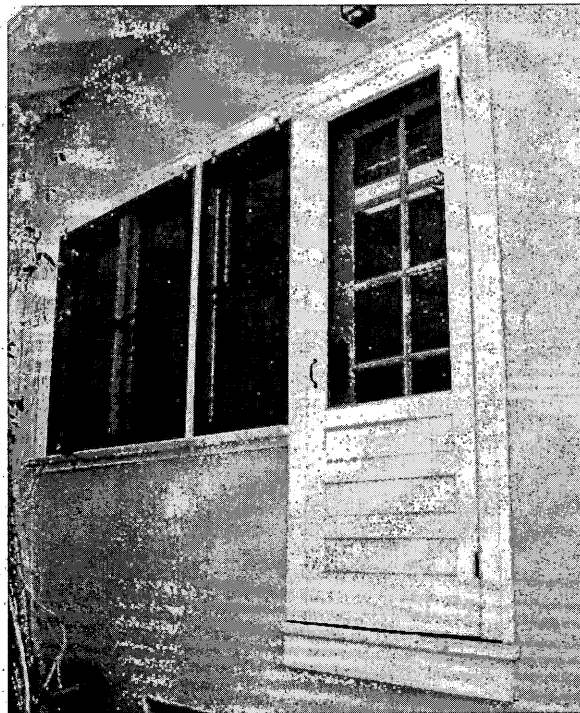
Looking northwest, south elevation, at a window opening resized for door opening; 1994 permit.
